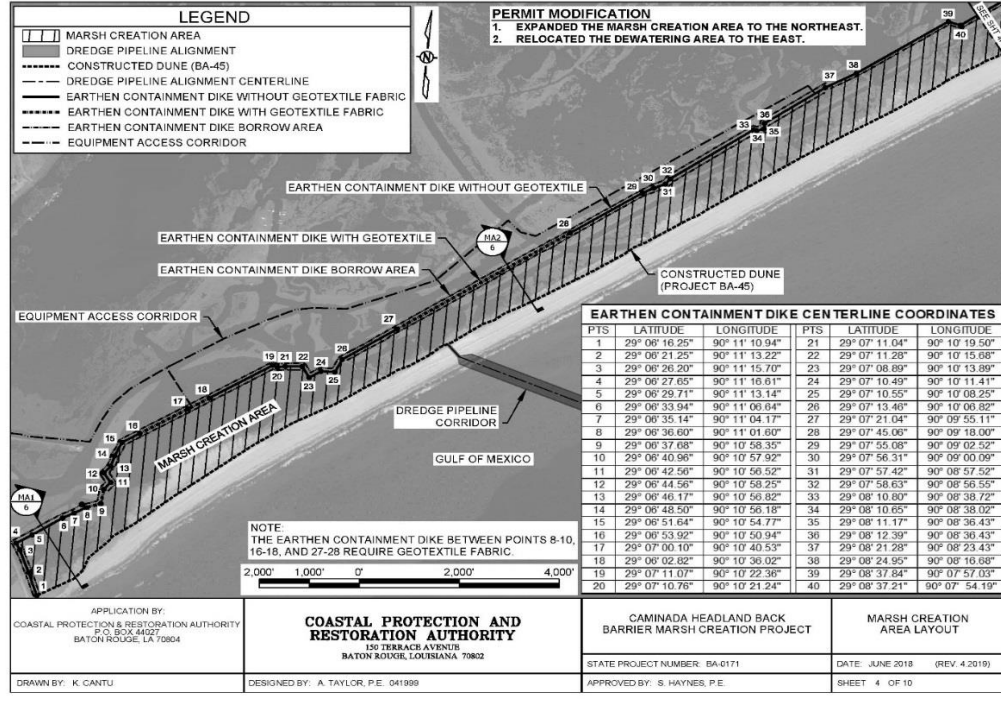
Plan view of the BA-171-2 earthen containment dikes (in the BA-171 project footprint)
